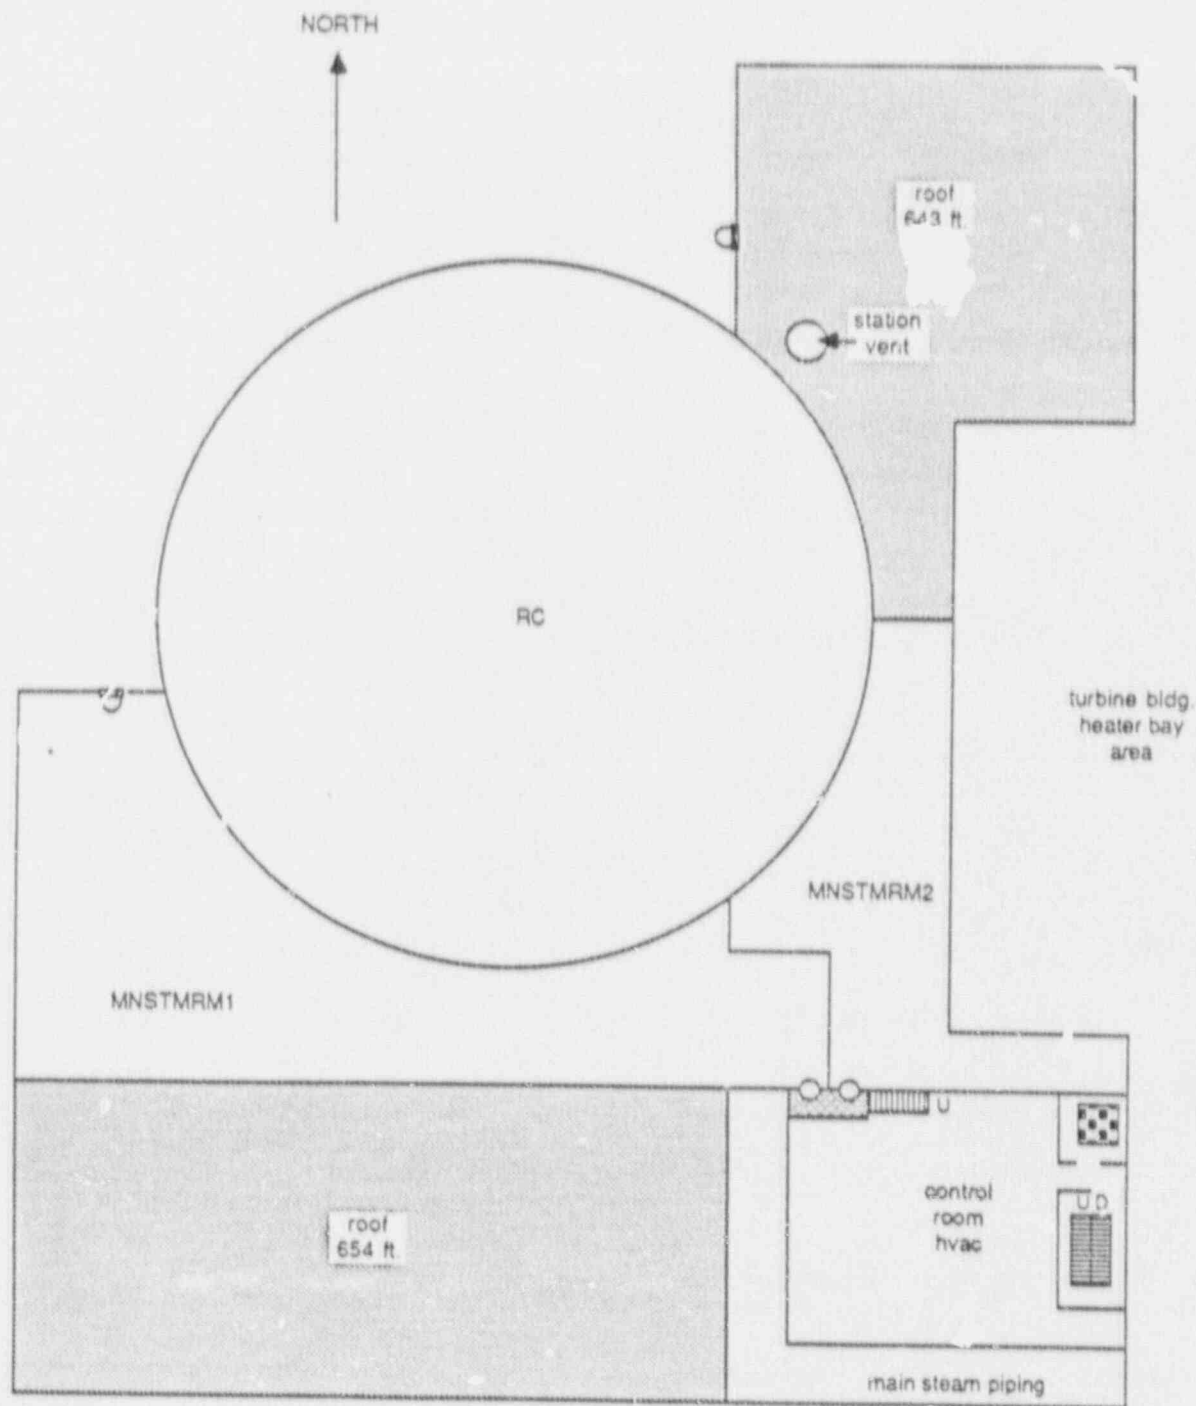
Davis-Besse Containment and Auxiliary Buildings, Elevation 638 to 643 feet
